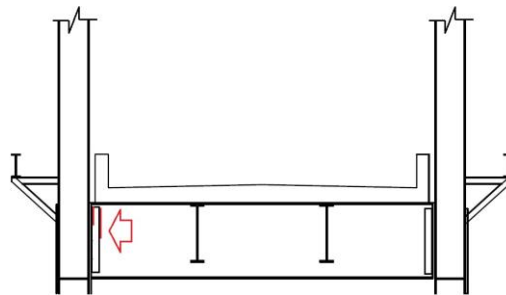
Cracks identified on transversal joist of the extremity of the bridge.
